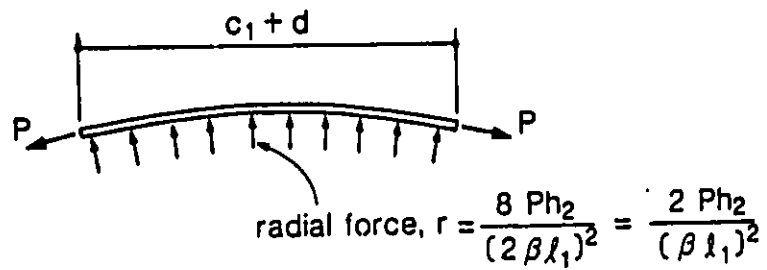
Calculation of vertical component of prestressing force crossing the critical section
